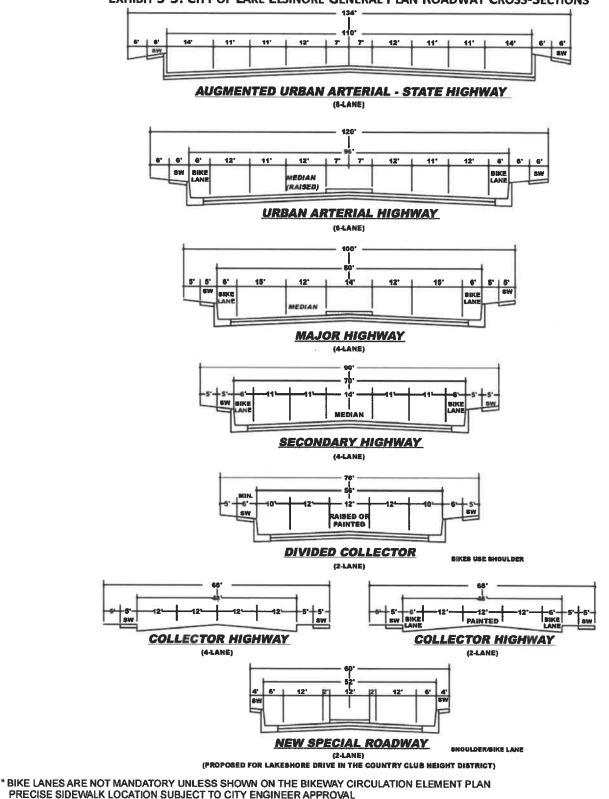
CITY OF LAKE ELSINORE GENERAL PLAN ROADWAY CROSS-SECTIONS
